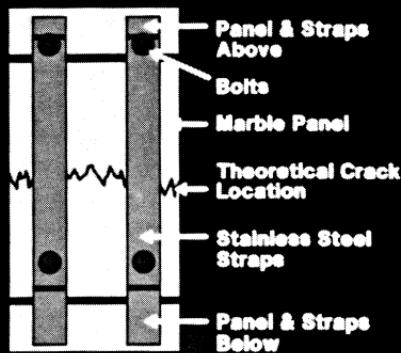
Elevation of straps used to temporarily restrain the marble panels.
